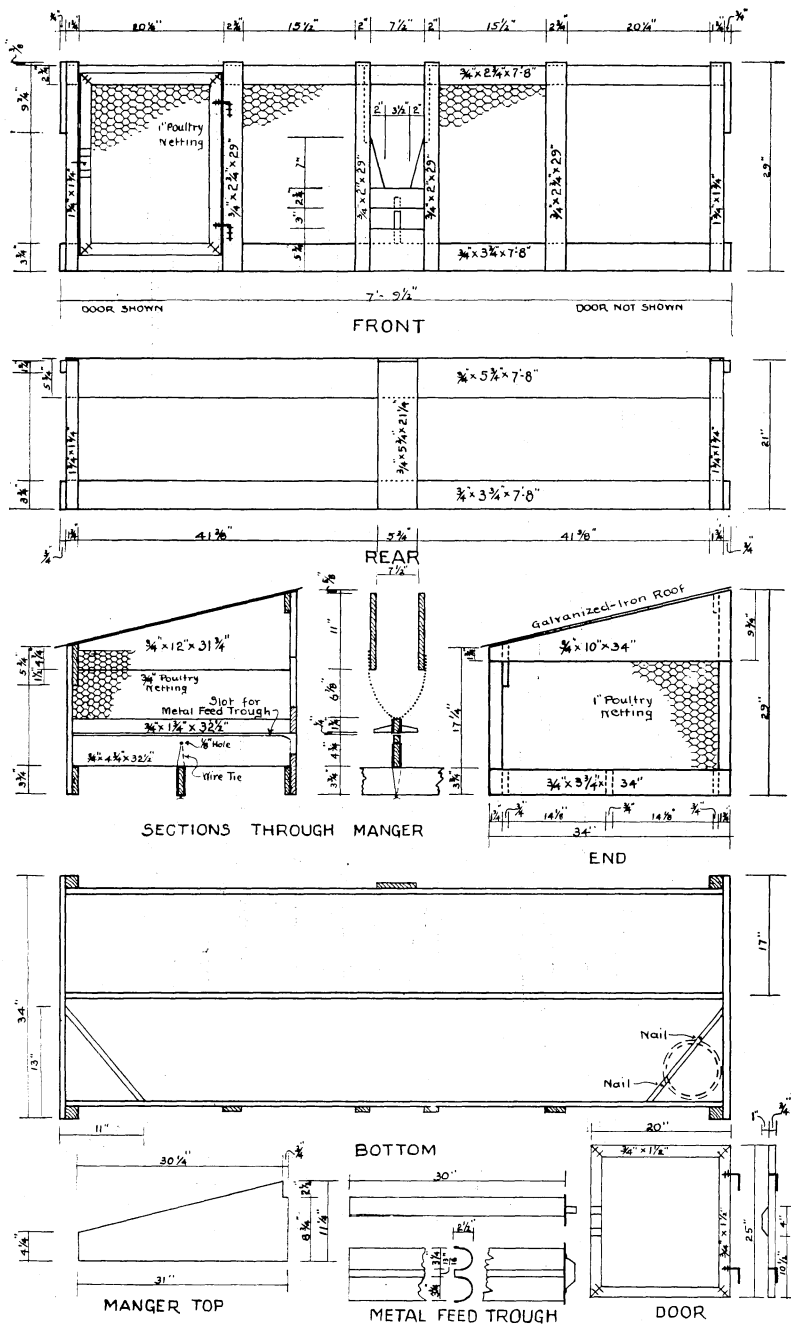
Construction details for a two-unit wooden-frame wire hatch.
